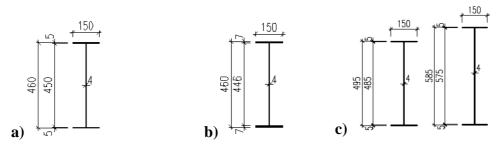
Cross-section: (a) Test 1; (b) Test 2; (c) Test 3
